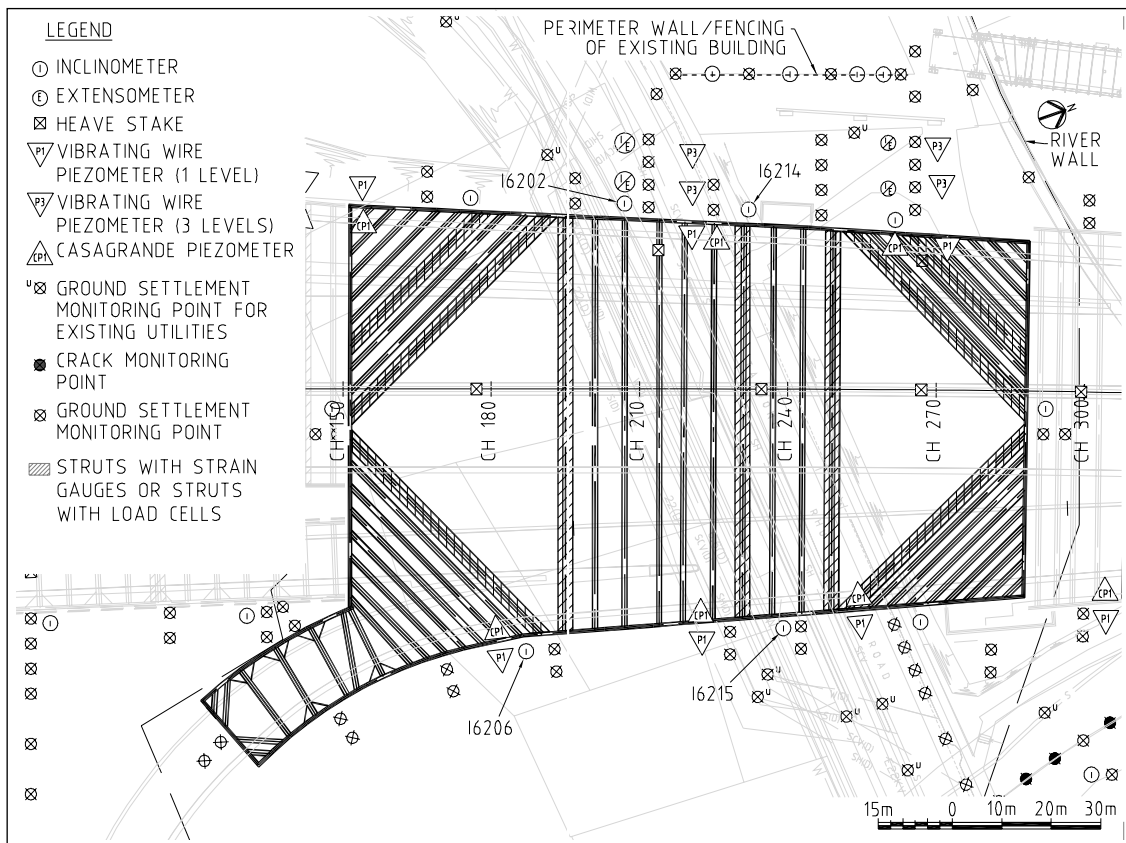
Instrumentation and monitoring plan of KPE C421 alignment adjacent to Camelot.
